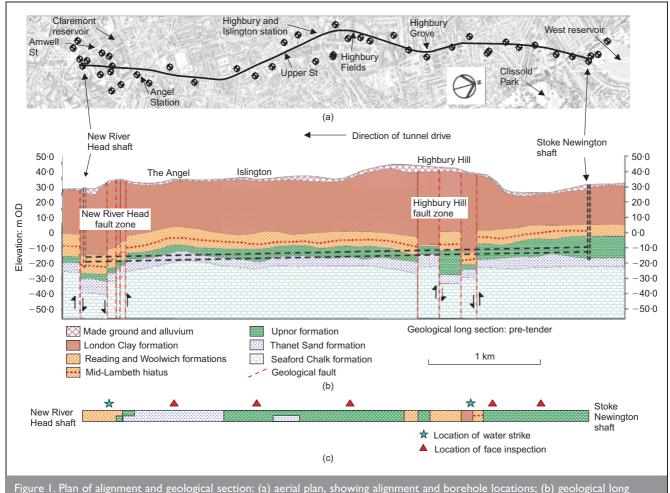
Plan of alignment and geological section: (a) aerial plan, showing alignment and borehole locations; (b) geological long
